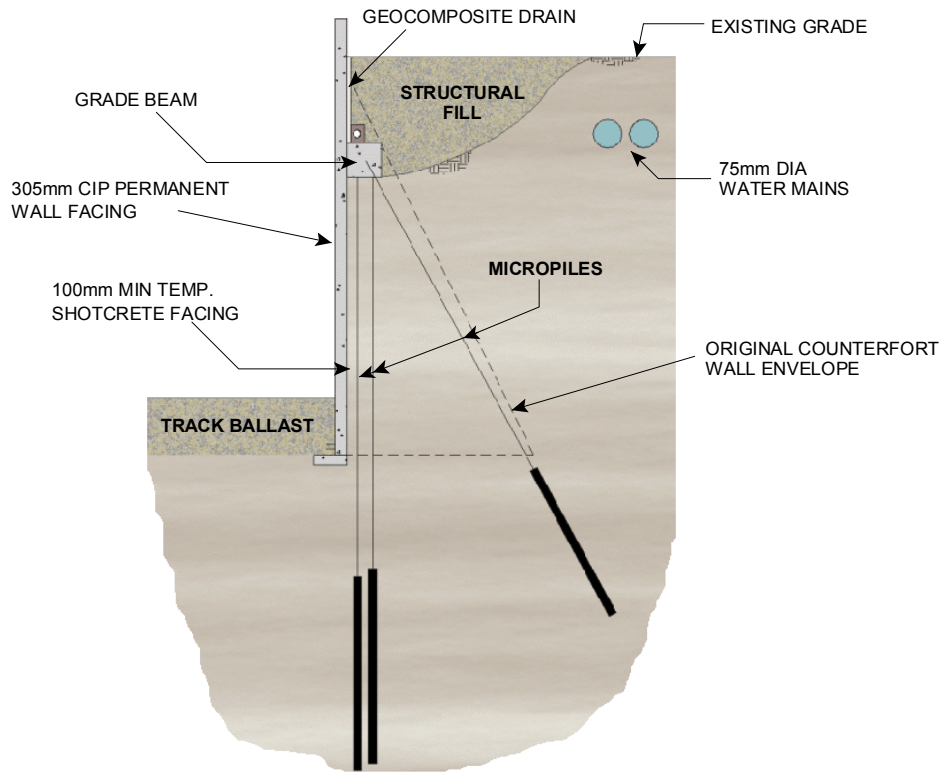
Wall 600 Permanent Earth Retention, Portland, Oregon (after Ueblacker, 1996).
